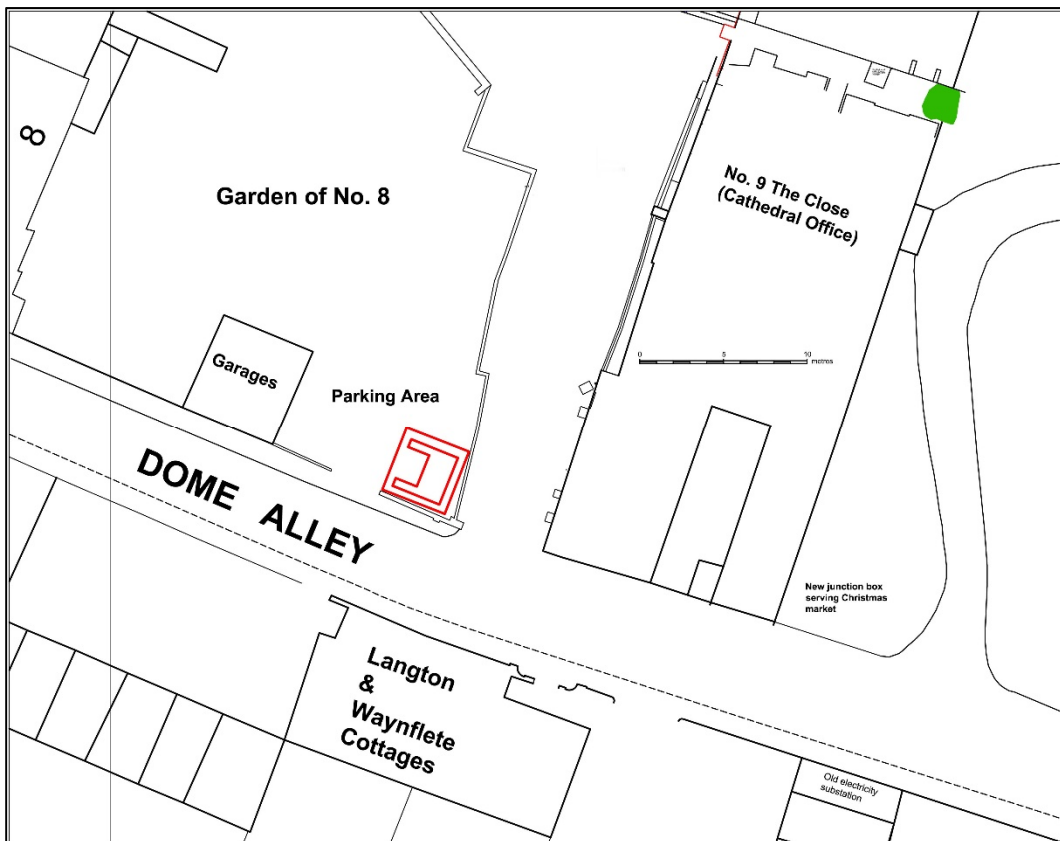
Detail showing in red the location of the proposed new electricity sub-station.
